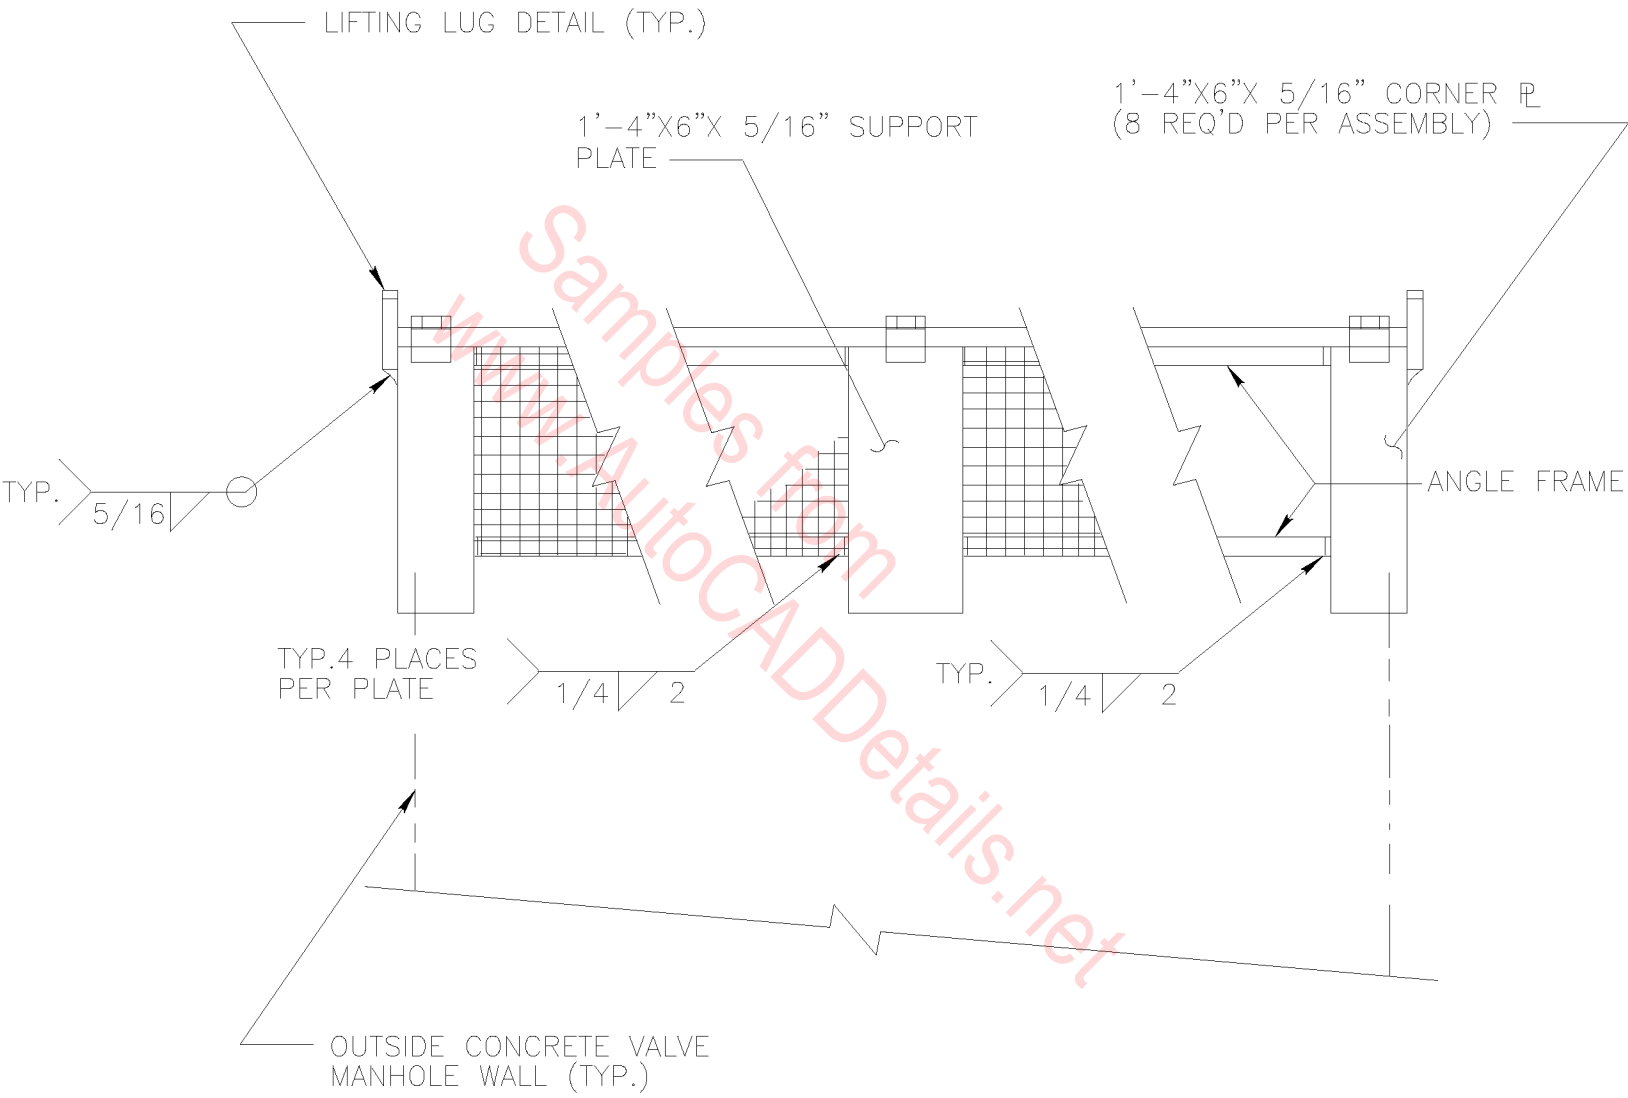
PLATE COVER SHOWN IS DESIGNED FOR LOADINGS UP TO 40 psf WHEN SPACING BETWEEN SIDWALL AND CENTER SUPPORTS IS LESS THAN 3'6". LOADINGS OR SPACINGS GREATER THAN THESE MUST BE DESIGNED FOR ON A CASE BY CASE BASIS.
